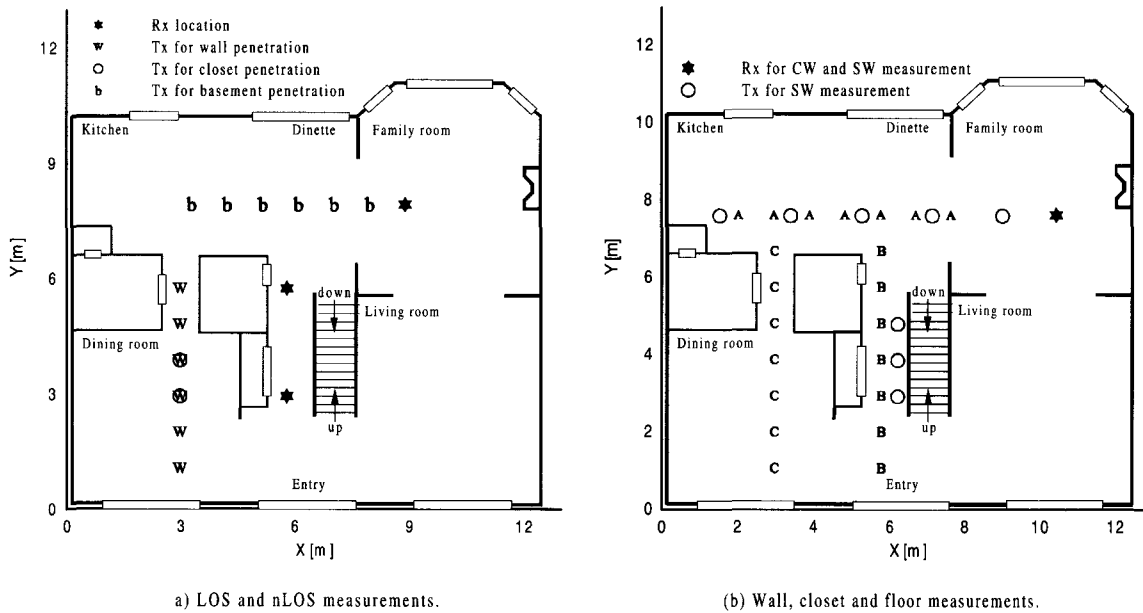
The floor plan of House3 with Tx and Rx locations for CW and SW measurements.
